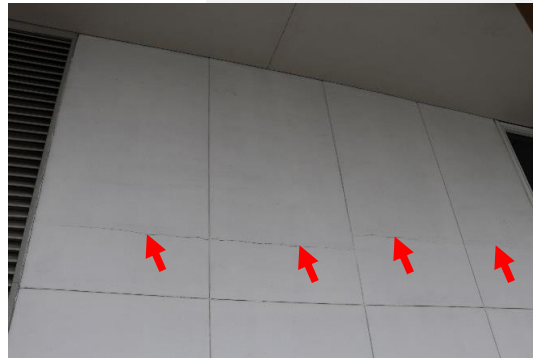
Horizontal cracks at the stucco walls at the Terrace Level west facade.
